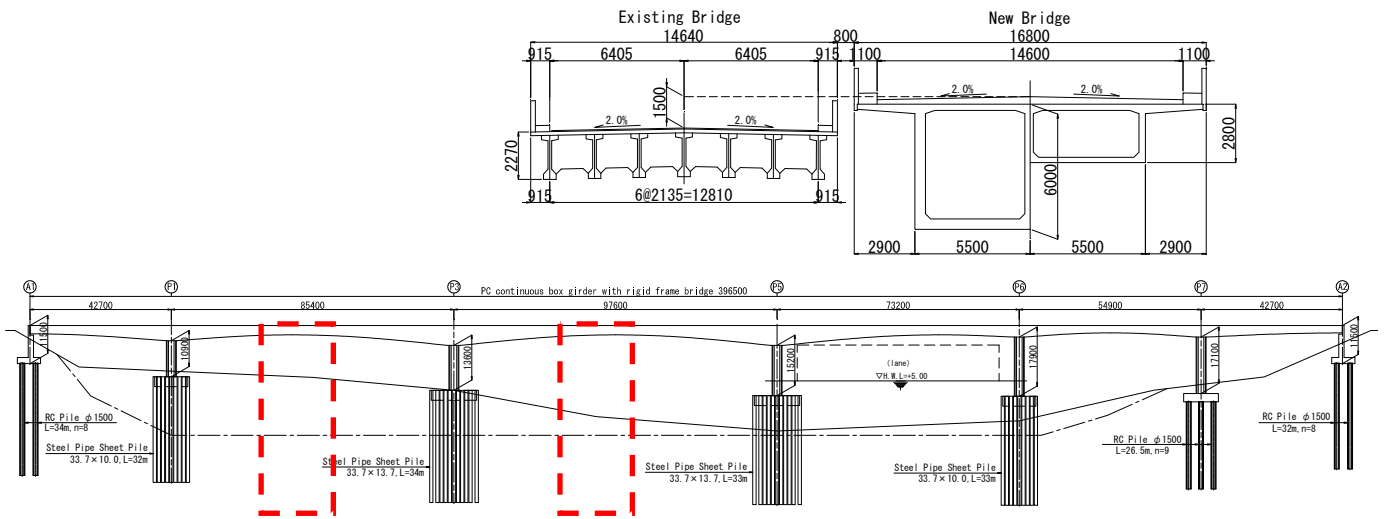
Cross-Section and Side View of Option-2 (Kanchpur Bridge)
